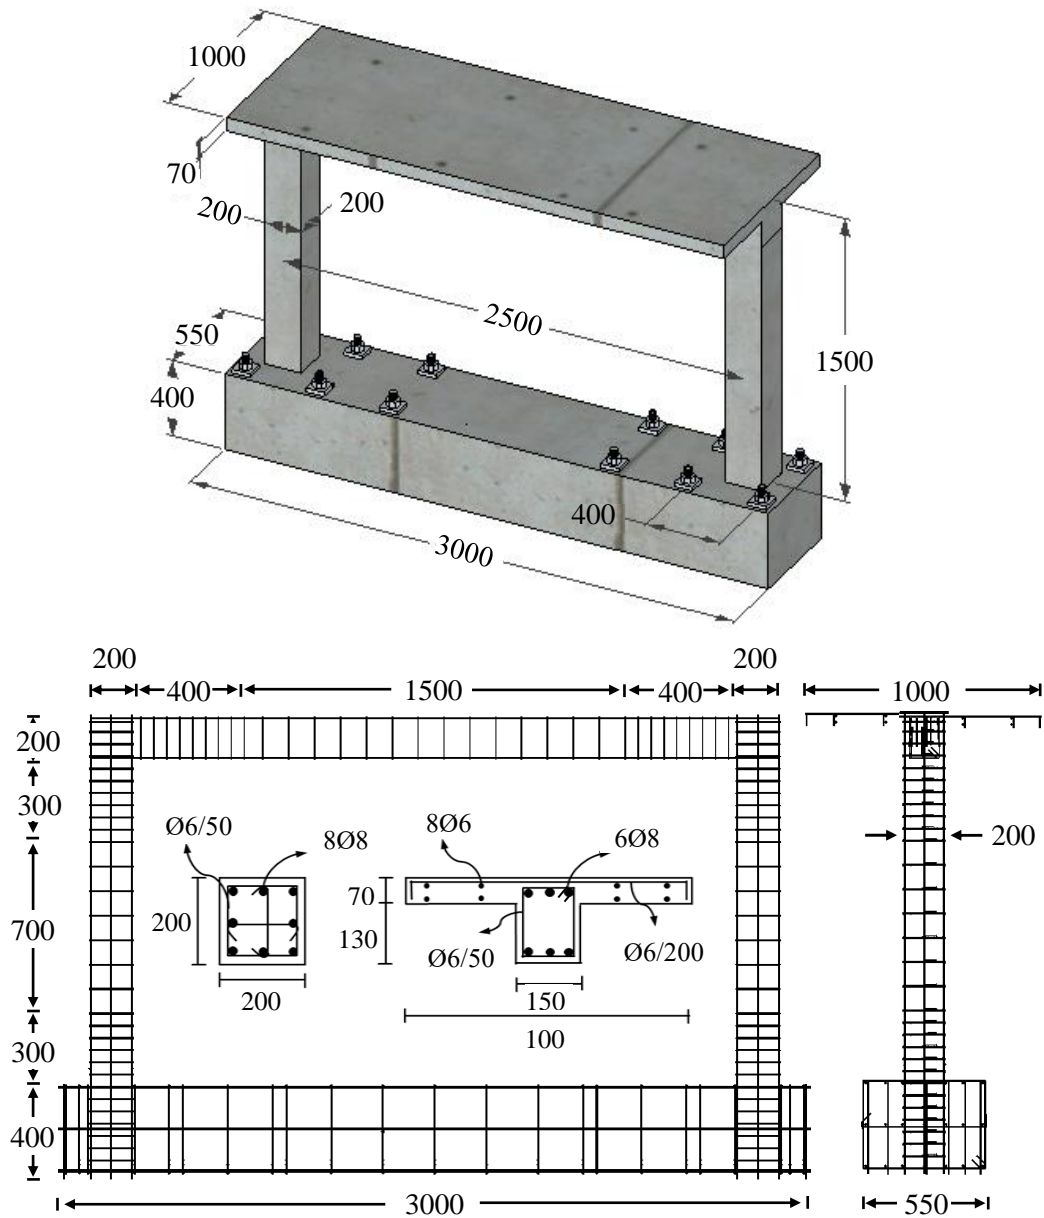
The specimen dimension and reinforcement (All units in mm)
